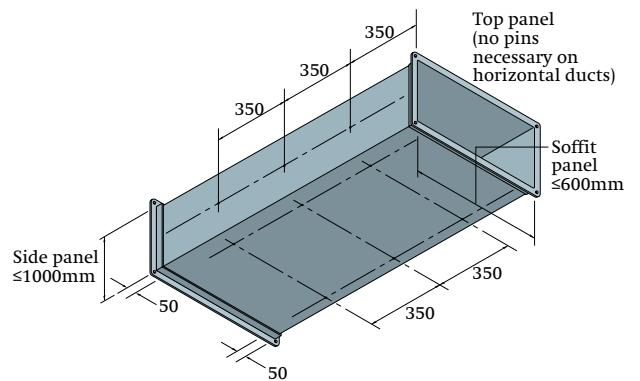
Steel pin arrangement where side panel does not exceed 1000mm and soffit panel does not exceed 600mm
